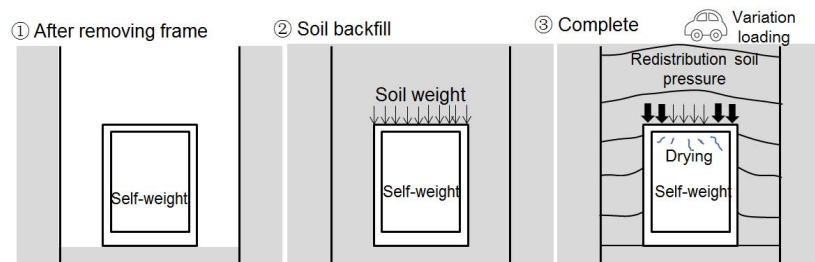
Open-cut construction and consolidation of backfill soil after dumping.
